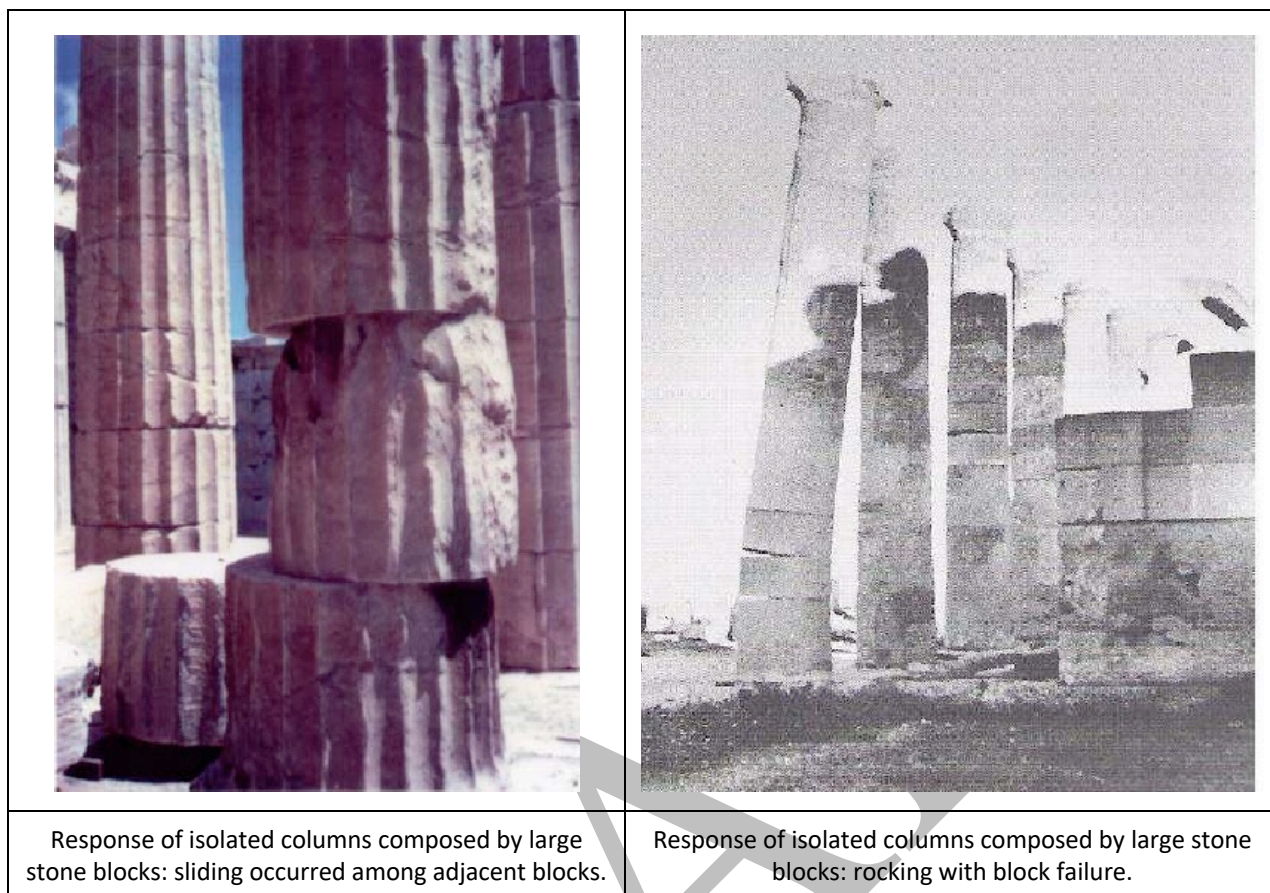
Class F – Rocking of single or multiple blocks: case of columns made by large stone blocks.
